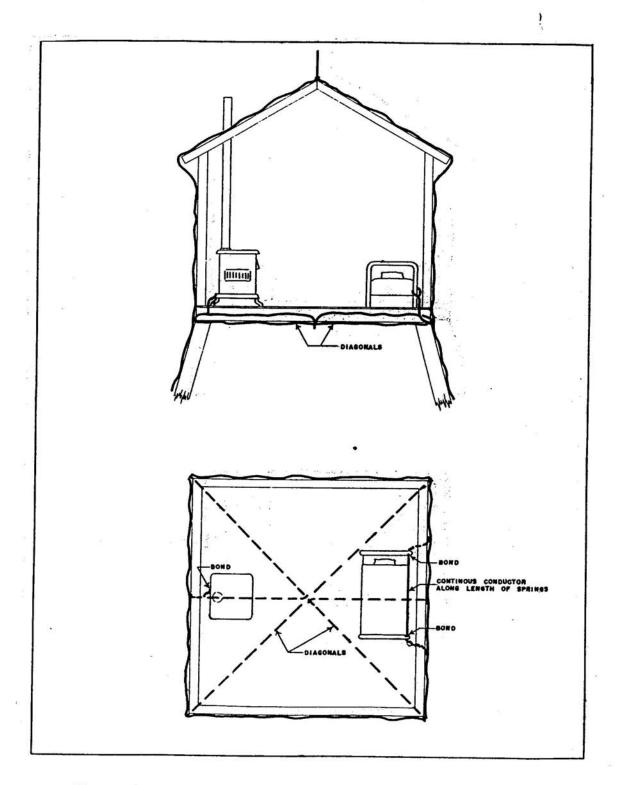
Typical layout of grounding for bed and stove (center line location).
